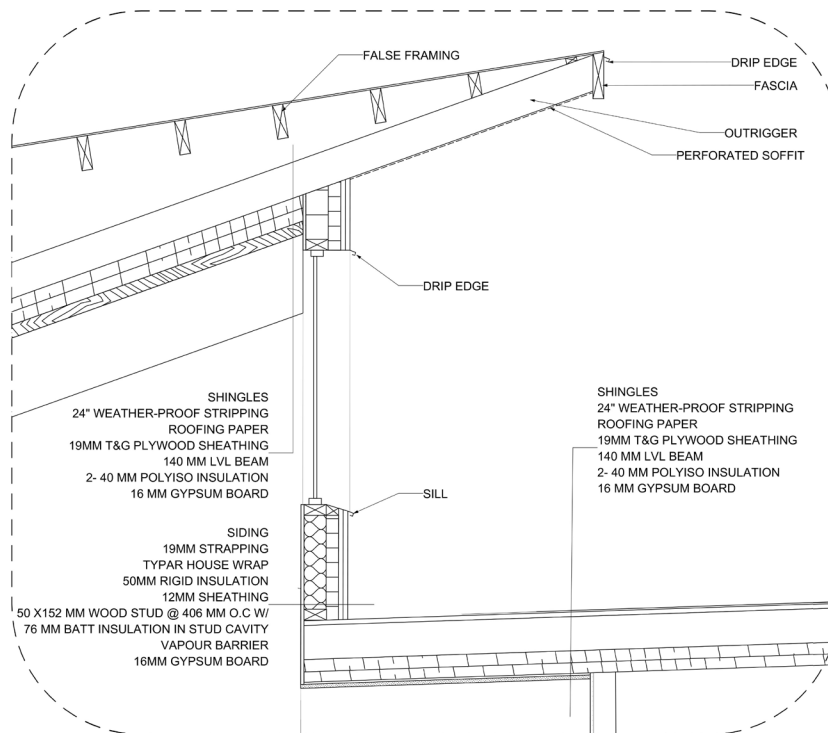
Double-Loaded Corridor Clerestory Connection Detail
